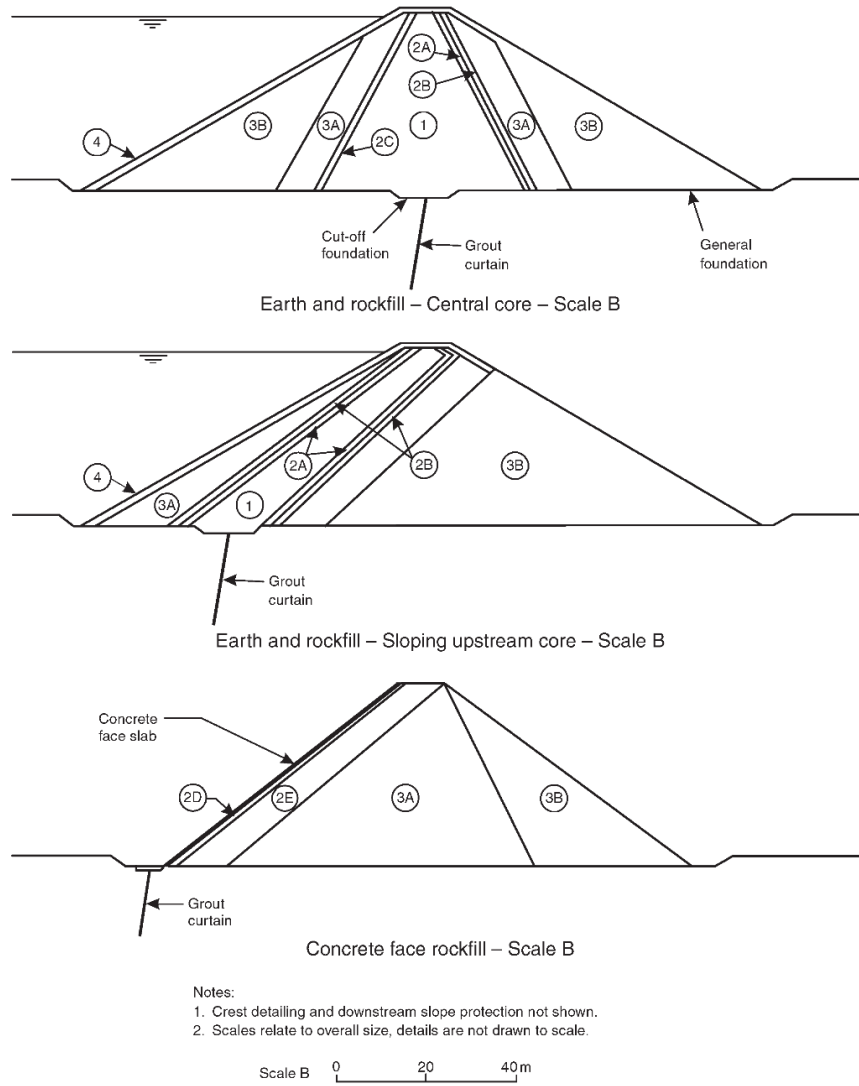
Typical cross-sections of earth-fill, rock-fill and concrete face dams (after Fell et al. 2005)
